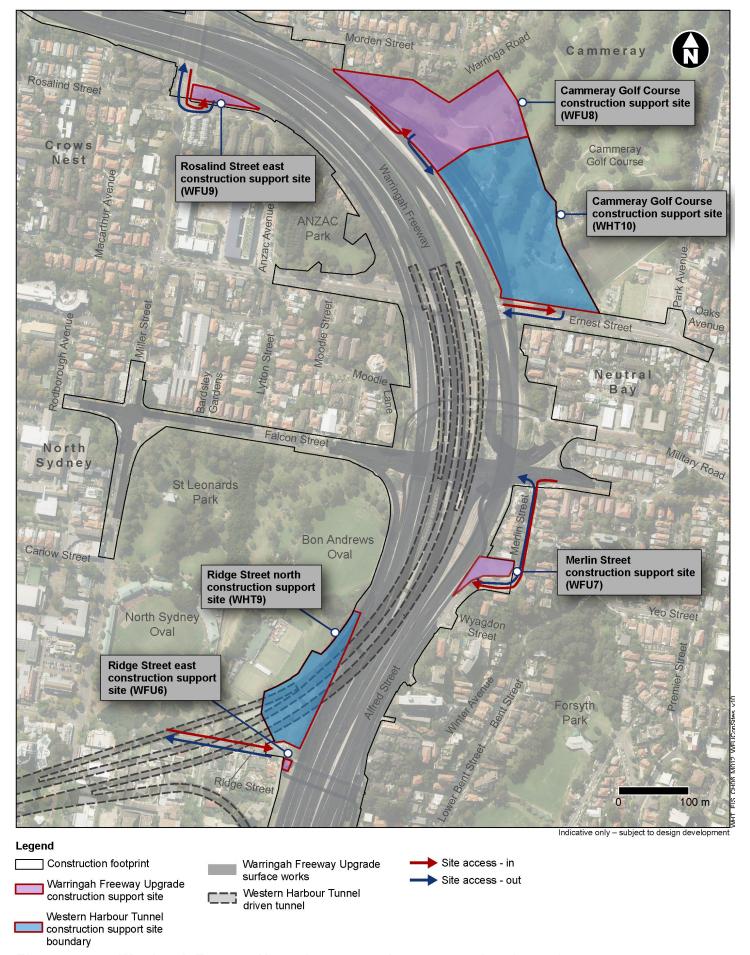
Warringah Freeway Upgrade construction support sites (map 2)
